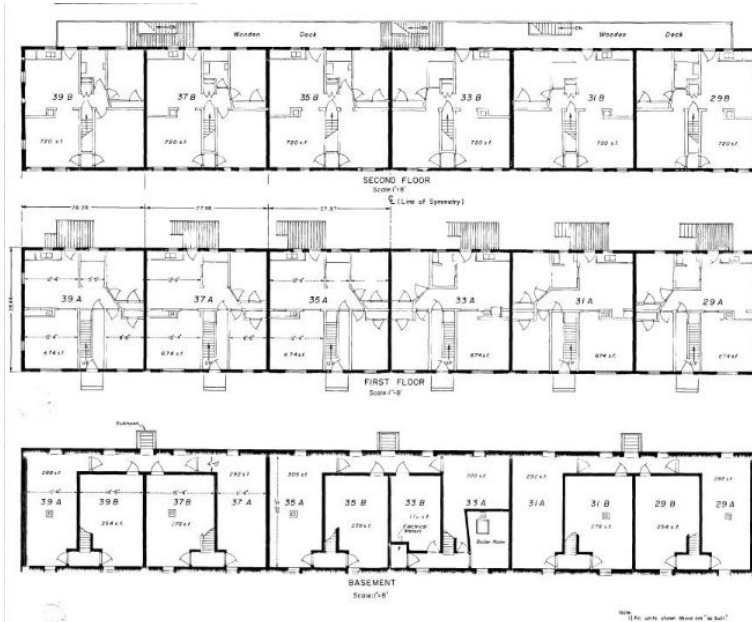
Floor Plan, 33 Mill Street (MCRD: 131/71-72, 1980)
